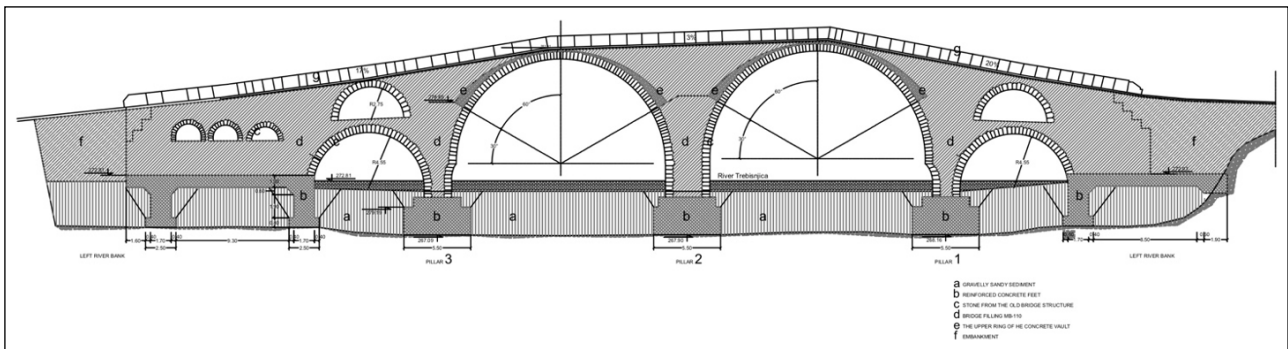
Structural integrity section of the reconstructed Arslanagić bridge (redrawn by the authors after Milan Gojković (1973)).
